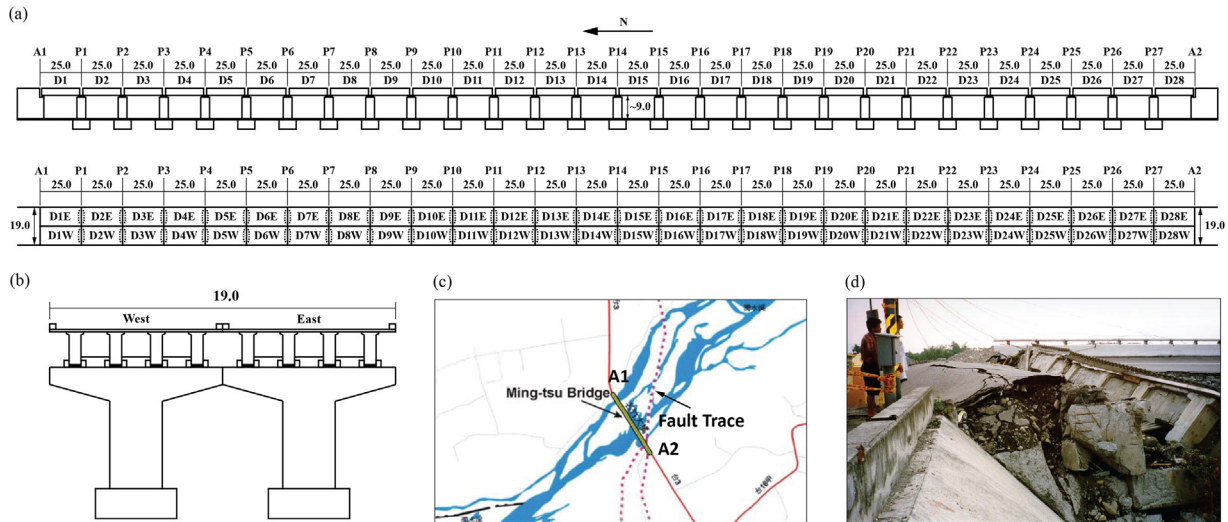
Ming-Tsu Bridge during the 1999 Chi-Chi earthquake: (a) elevation and plan views of original bridge (unit: m); (b) typical section of bridge (unit: m); (c) map showing bridge crossed by surface fault rupture; (d) failure of backwall and backfill behind southeast abutment (Fig. 10c is modified from Buckle and Chang [15]; Fig. 10d is reprinted from Buckle and Chang [15]).
